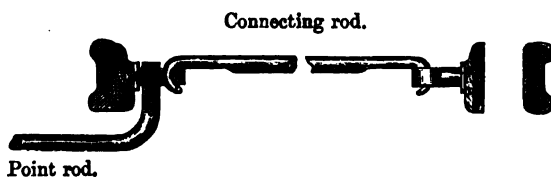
Cross section of a pair of points and stock rails with connecting rod and point rod.
